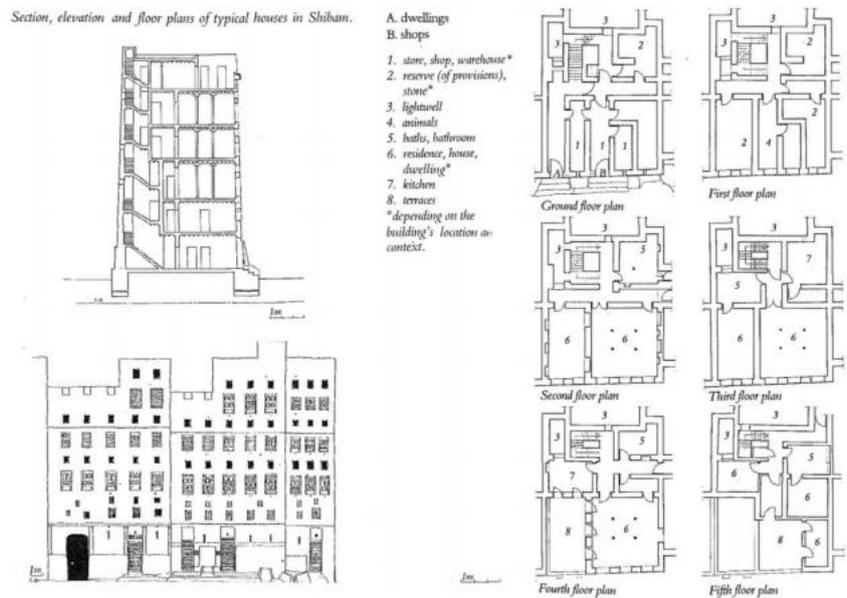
Layout of the traditional house in shibam(source:UNESCO, 2007).
